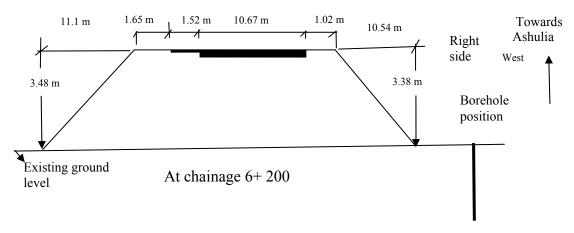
Position of bore hole at toe of embankment (x –section) of Tongi – Ashulia – EPZ Road.
